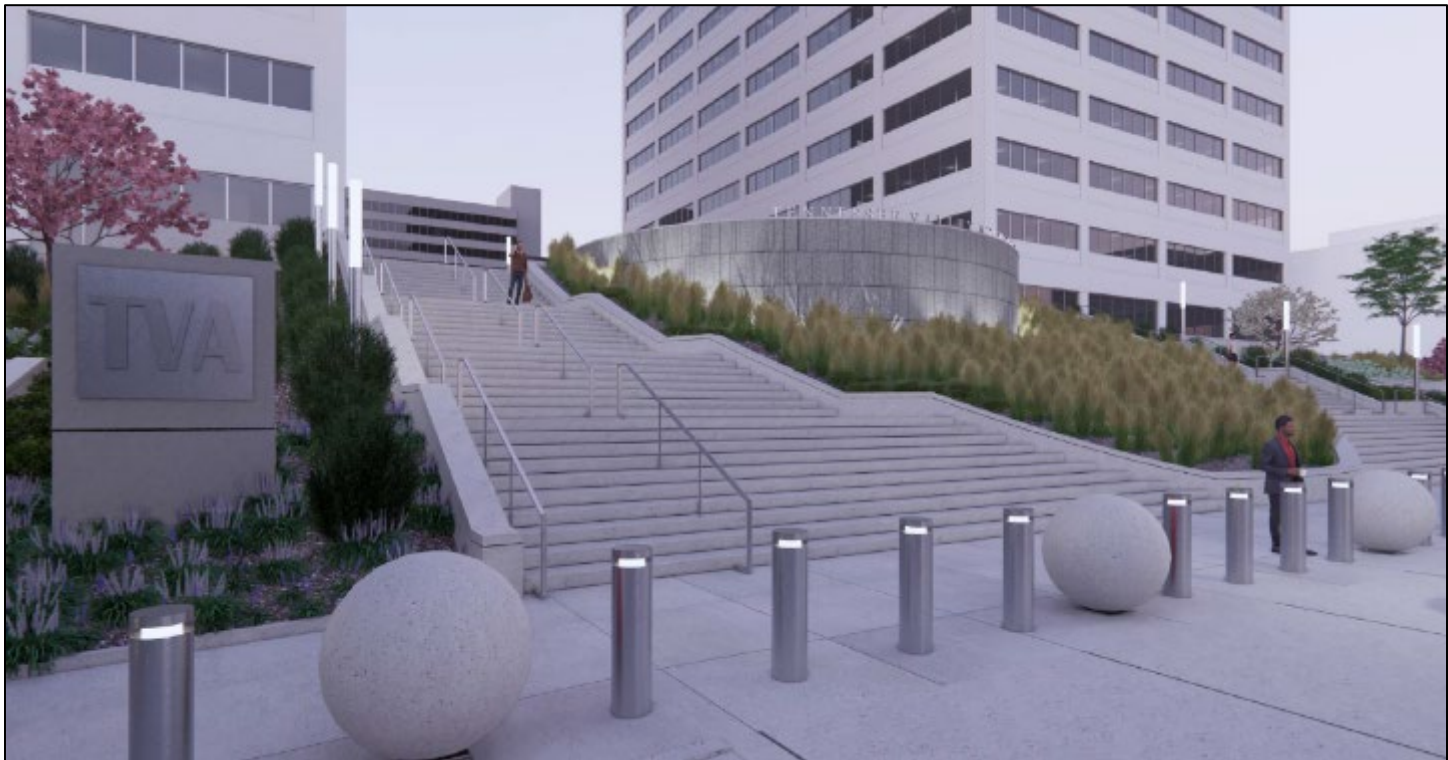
View of proposed bollards and KOC Plaza from Wall Avenue, facing north.
